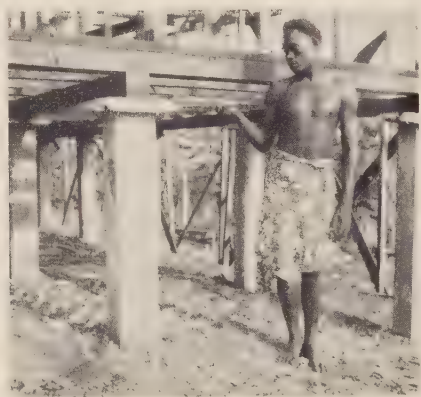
Metal shields on top of concrete pillars protect new building from ground-dwelling termites.
